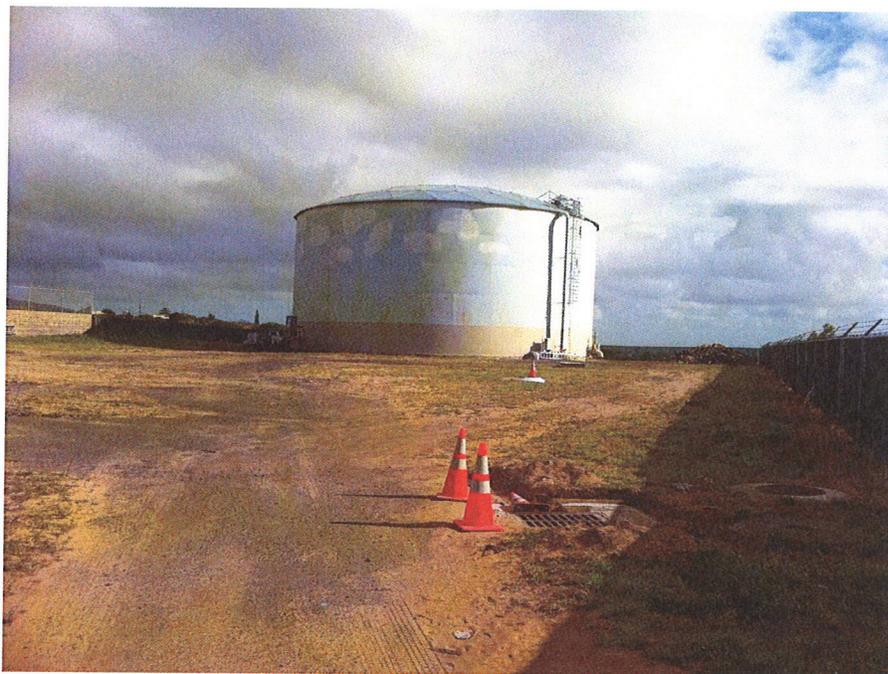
Existing 1.5 MG Water Tank from End of Driveway Access Road
